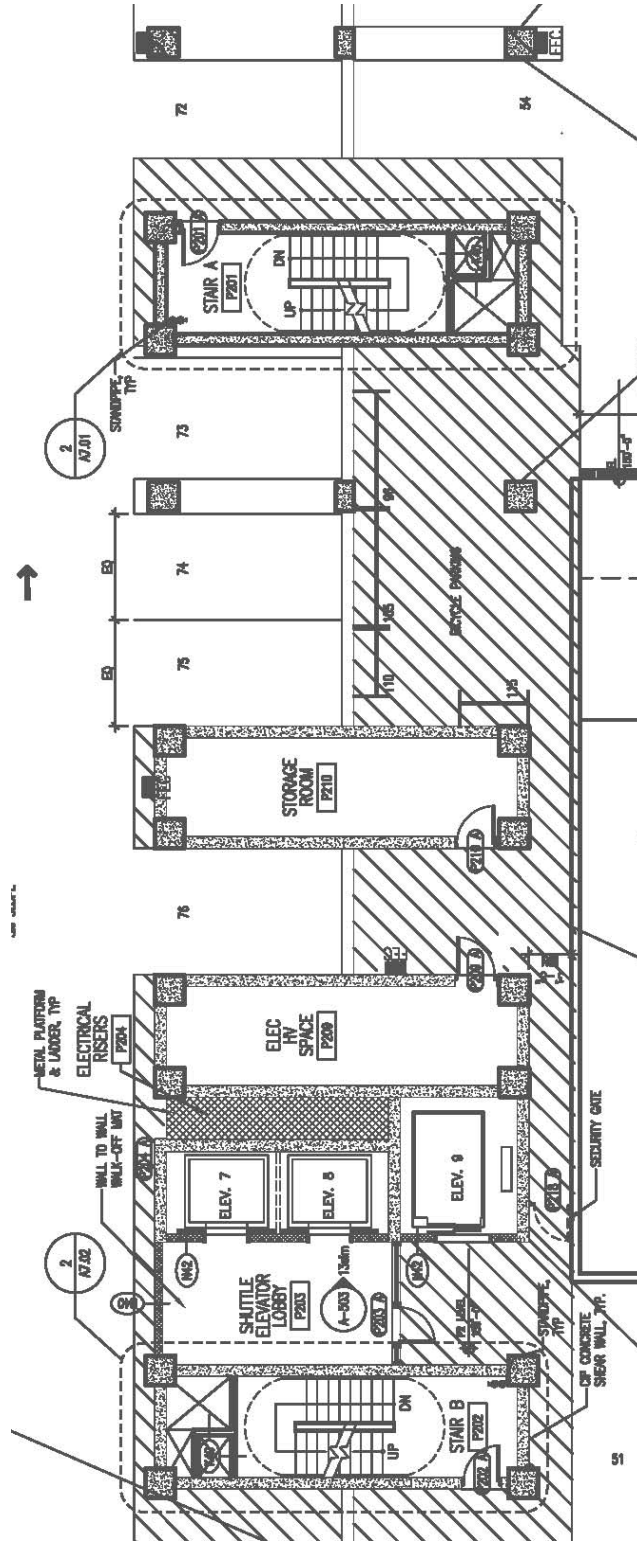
Revised Parking Garage P2 Level Service Core Plan
